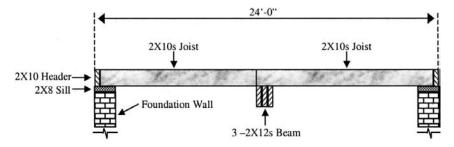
Joist framing detail (Section BB from Fig. 11.2).
